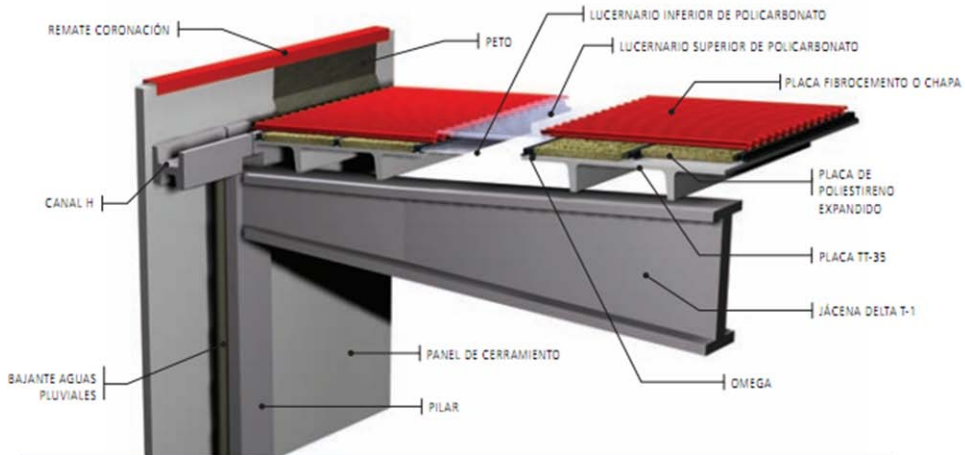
Double tee slabs for sloped roof construction (Trumes)
